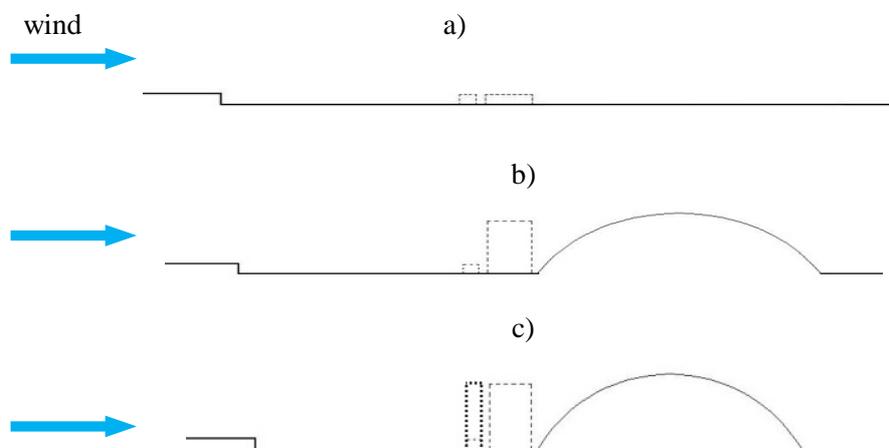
A cross-section of the roofs: a – before the construction of the arched roof; b – after the construction and c – the height of a chimney as recommended. Wind direction is marked
